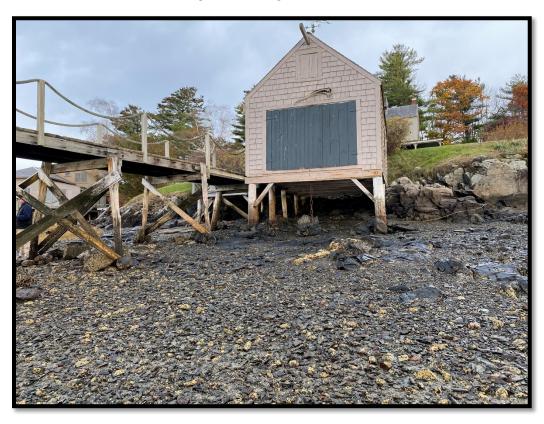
Existing Boat House – Facing North from Intertidal Zone
